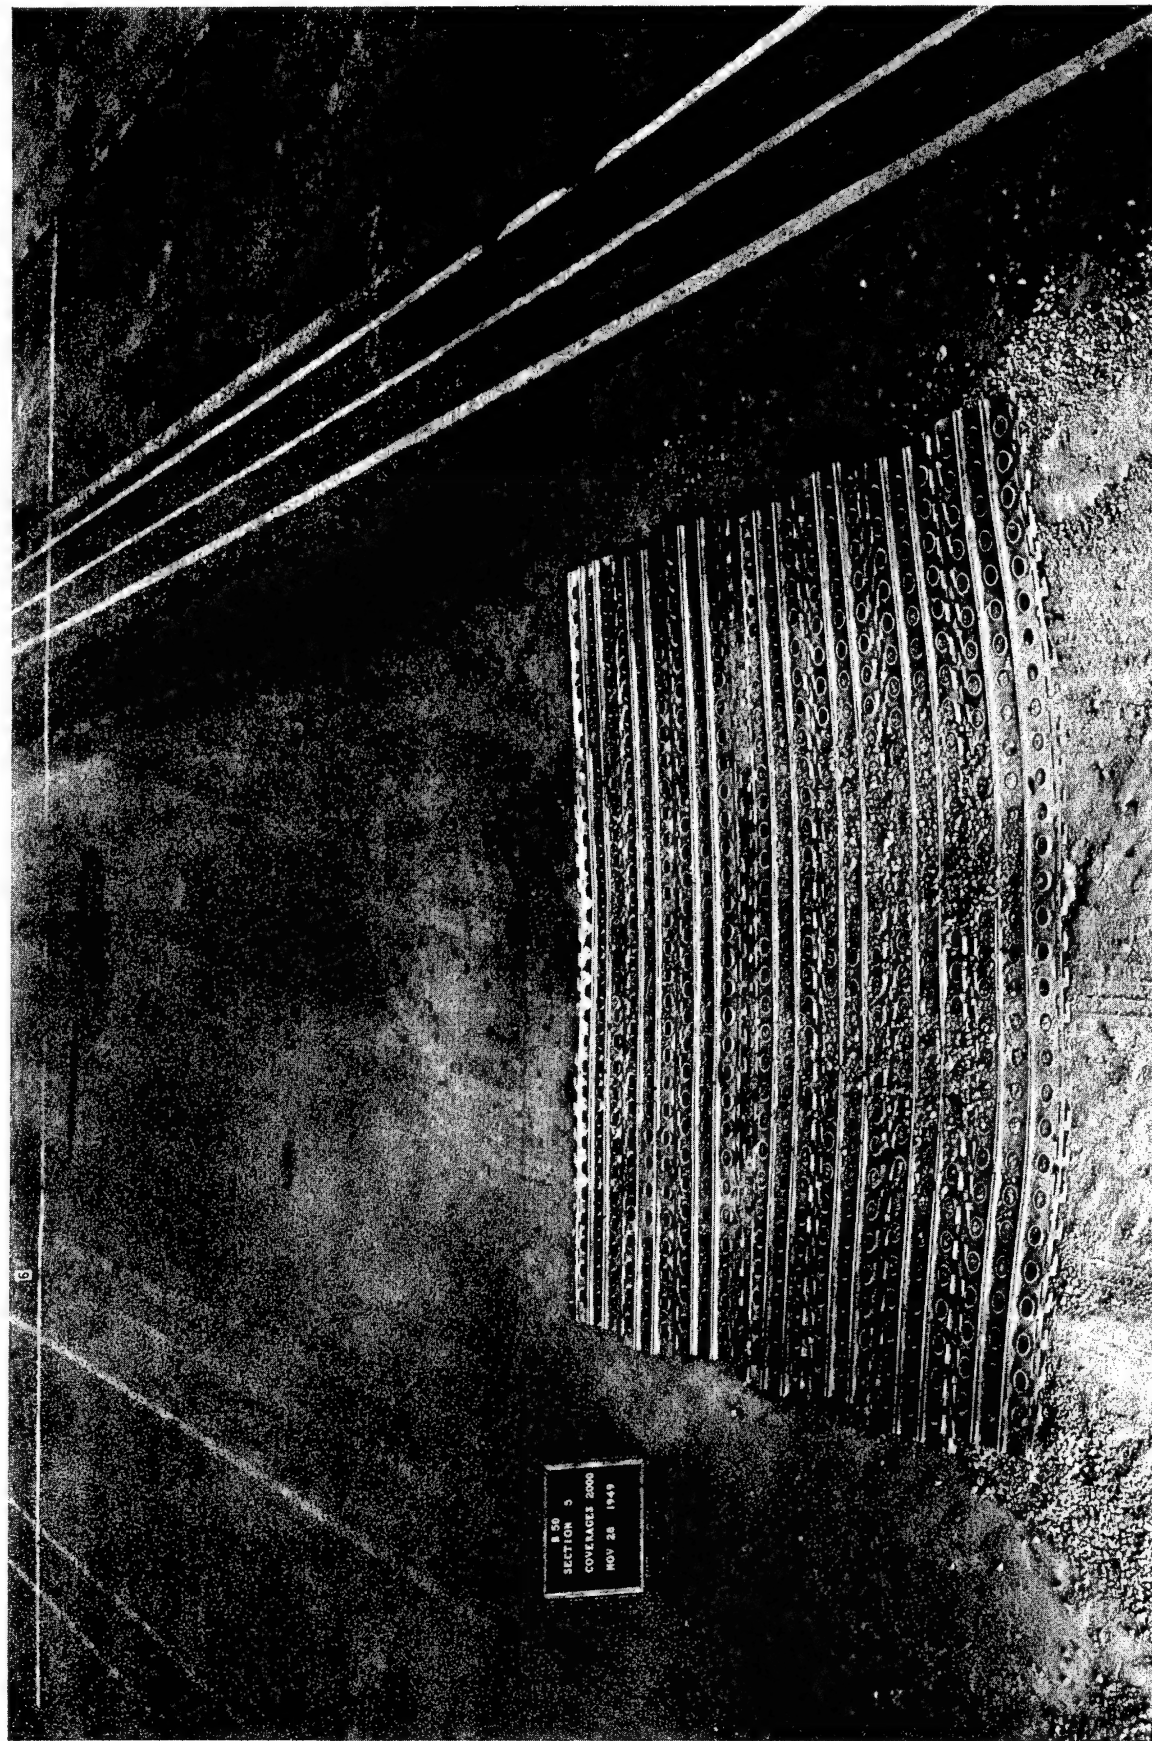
Unit 4, 10-in. thickness. View showing condition of pavement after 328 coverages with 100,000-lb load on B-50 assembly
